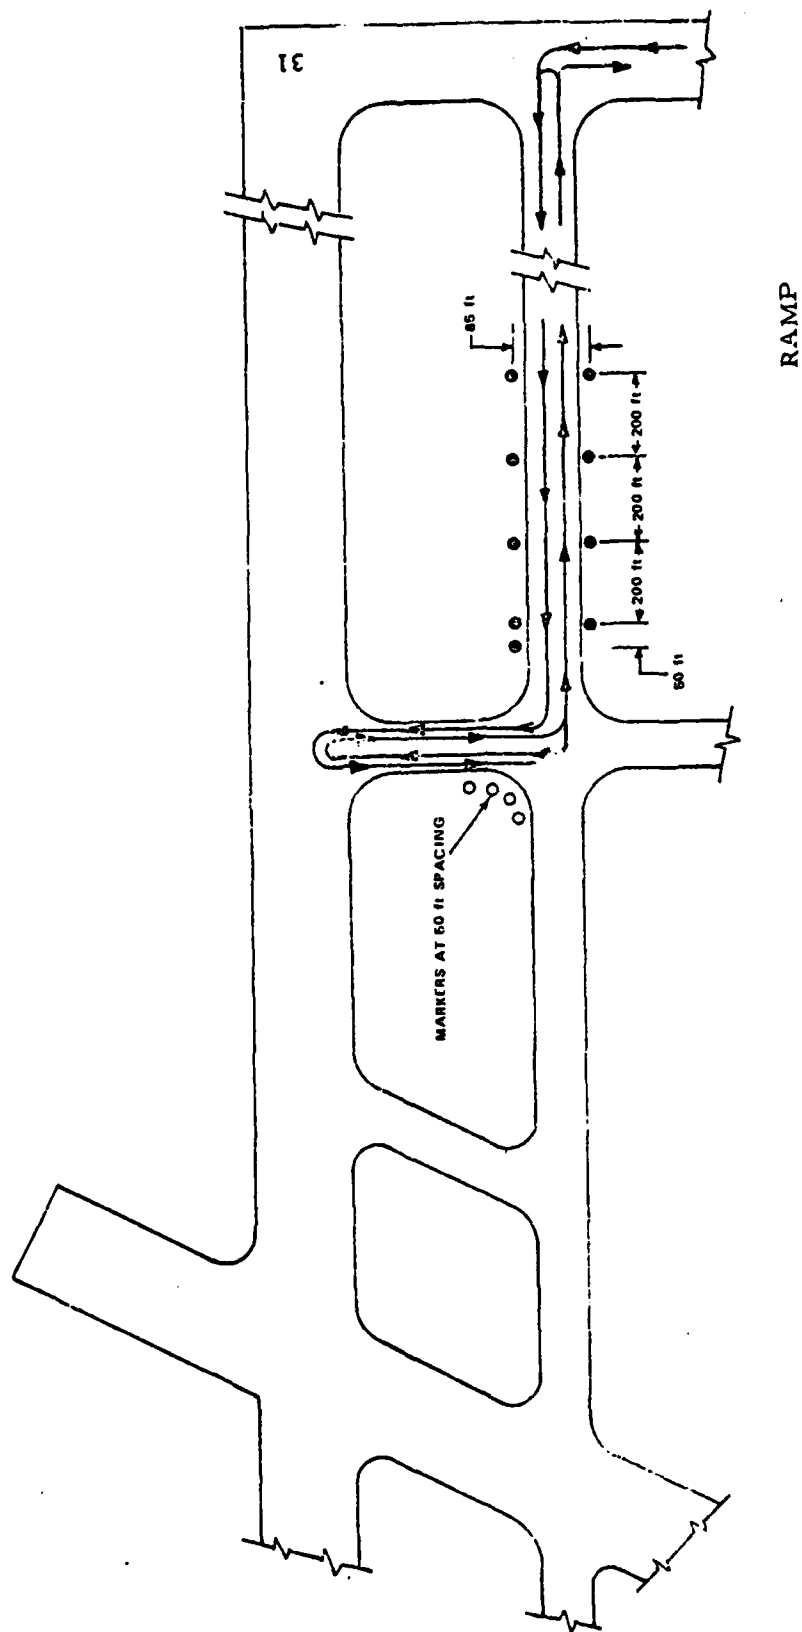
TEST INSTALLATION AND TAXI ROUTE
